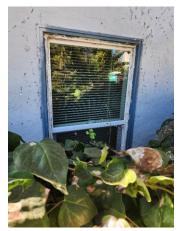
Detail view of a wood window on the north façade of the rear building, looking south.
